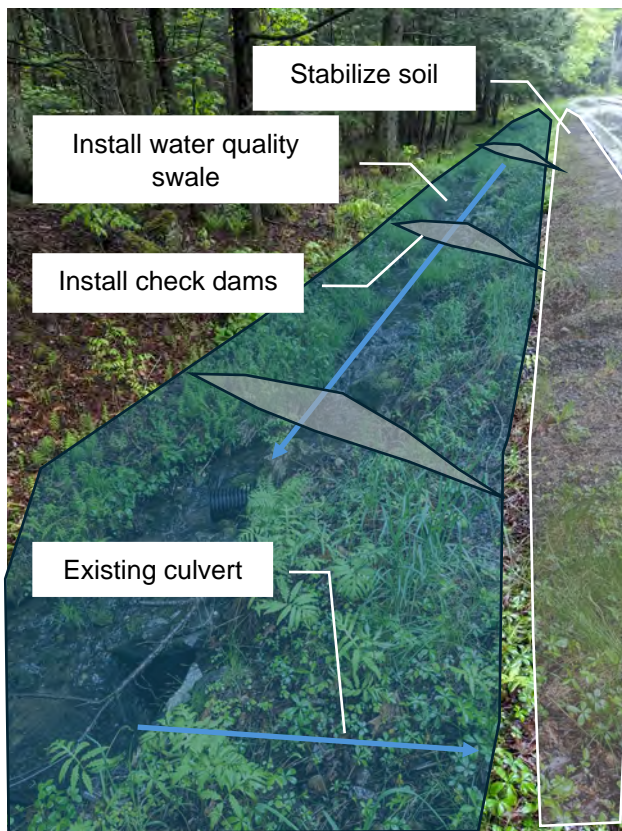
Roadside ditch along the western side of Ashfield Road
